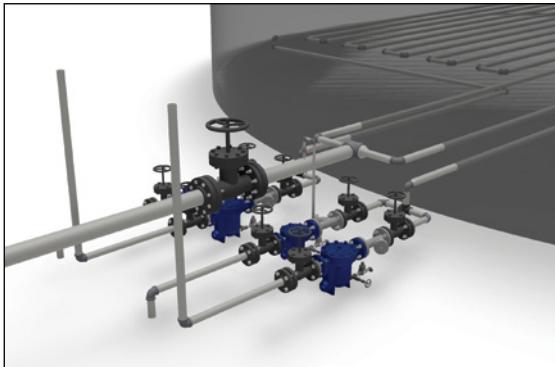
A 3D drawing can help installers better understand how to properly design pipe systems
